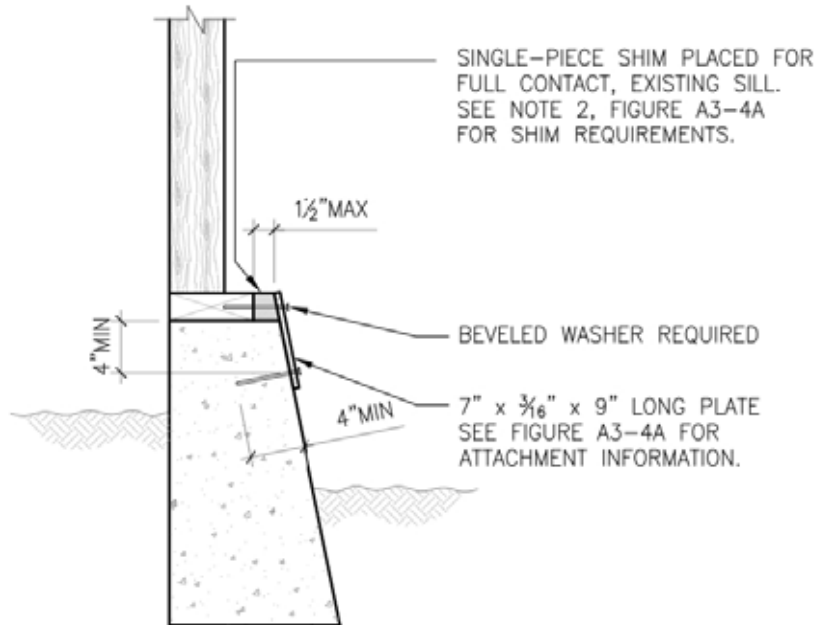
A - ALTERNATE SILL PLATE BOLTING IN EXISTING FOUNDATION WITHOUT CRIPPLE WALLS AND FLOOR FRAMING NOT PARALLEL TO FOUNDATIONS
